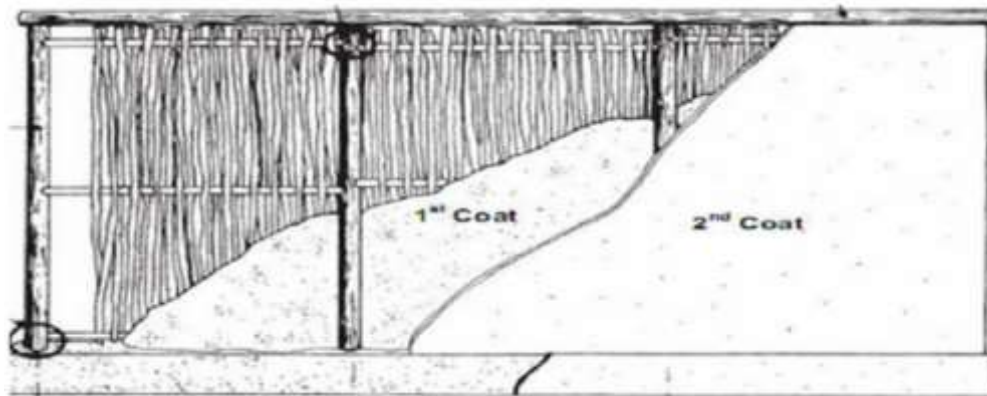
Section of a bamboo strips frame wall plastered with mud or cement (Ikra Wall)
